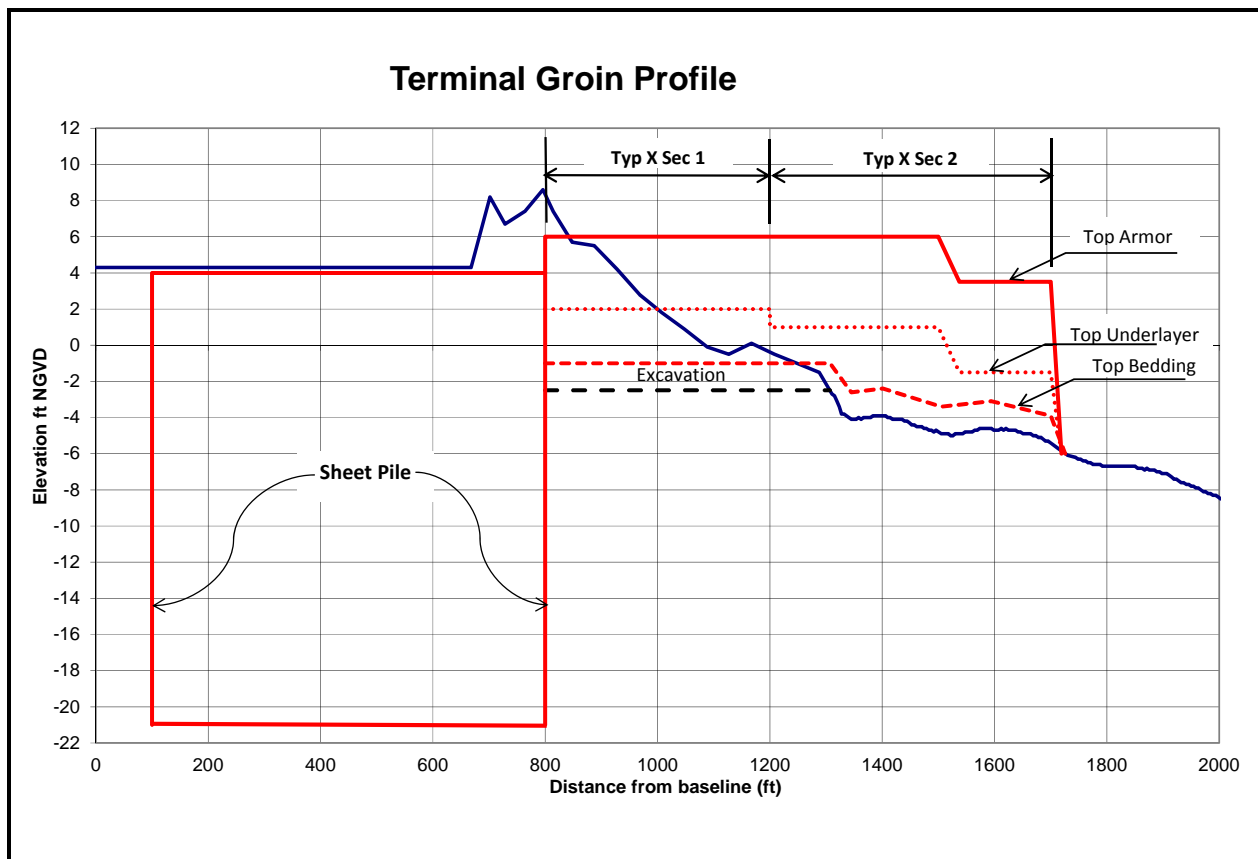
B: Groin Elevation with Adjacent Beach Cross-Sections.
